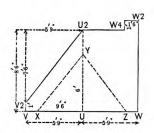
Shape of Nos. 13 and 14 in'Roof Plan.
